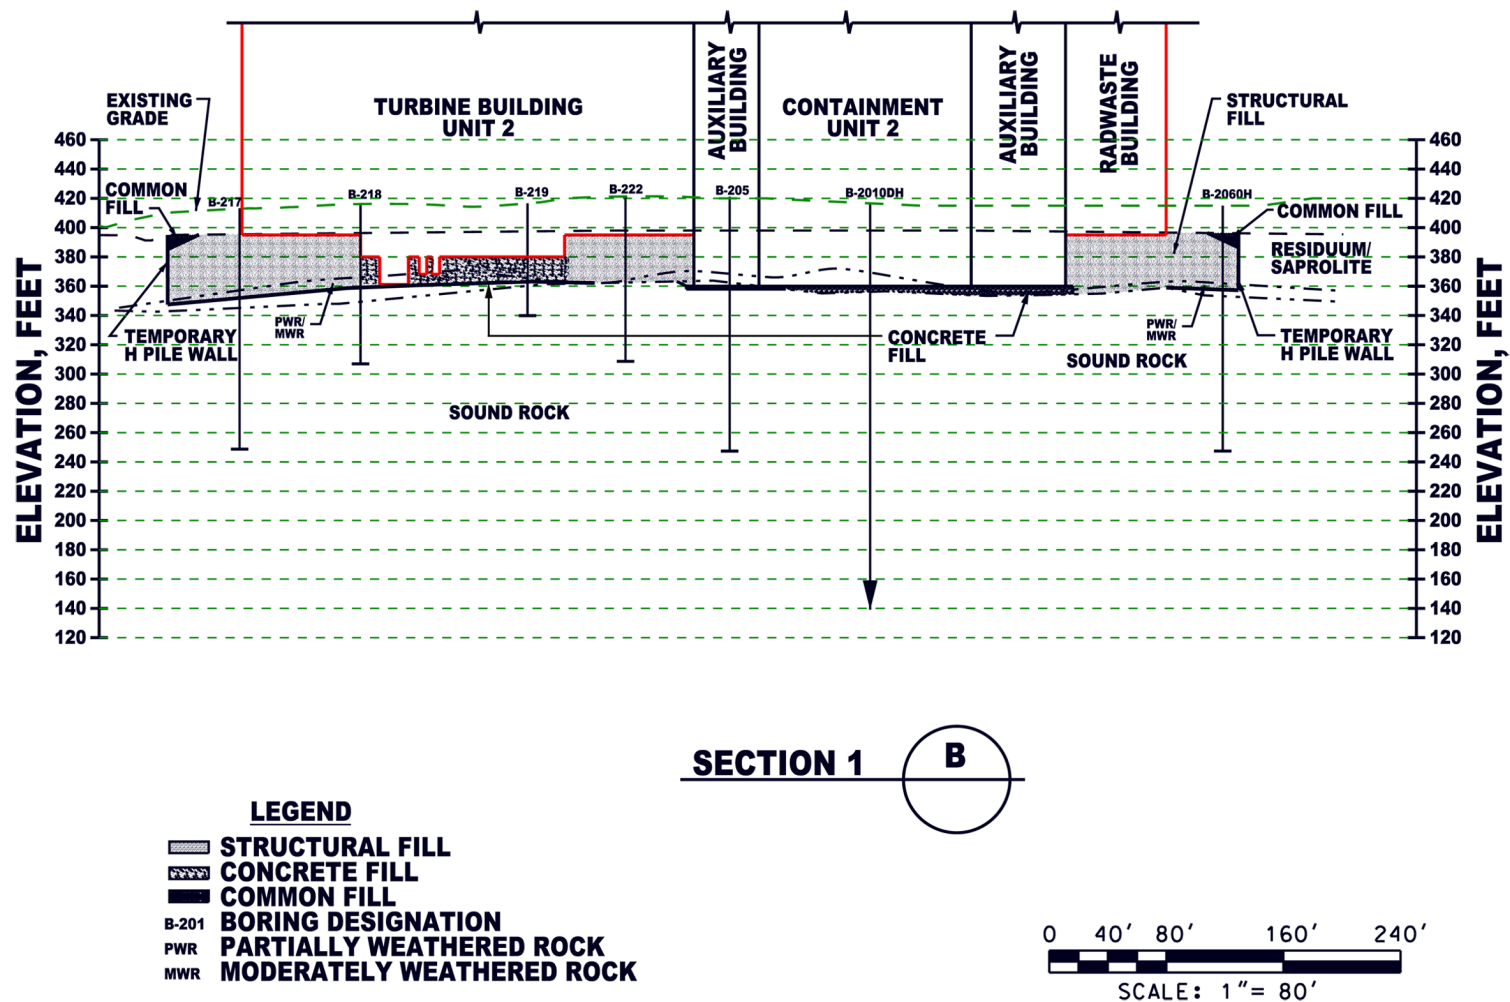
Cross-Section of Structure Foundation B-B
